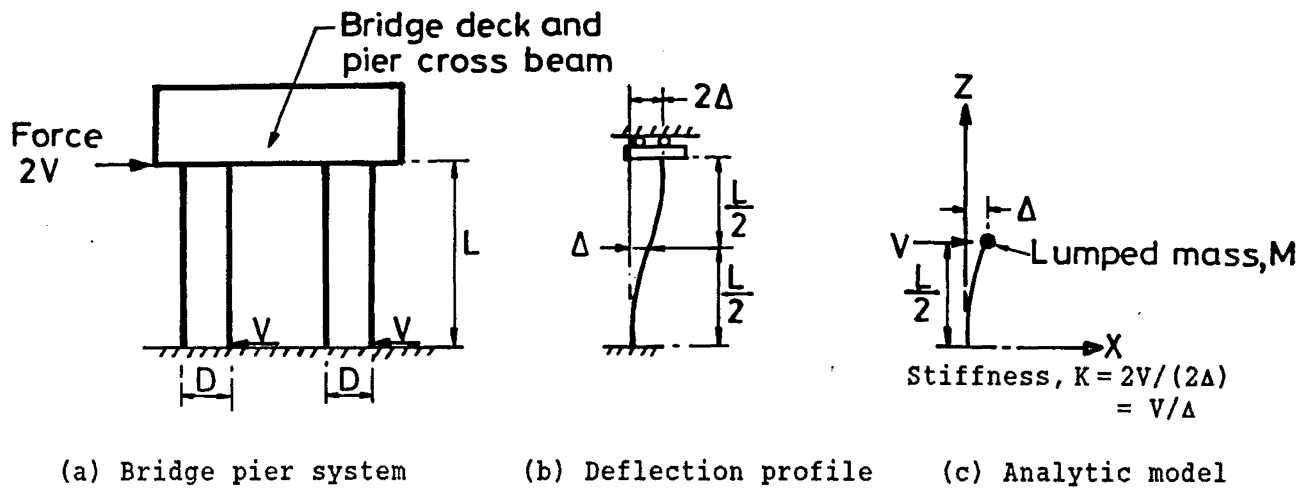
Bridge pier system subjected to lateral and gravity loads
